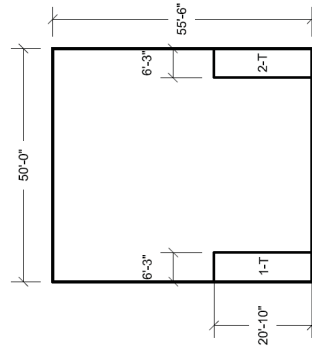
H.6-118: COOLING TOWER EAST WALL LOOKING WEST
